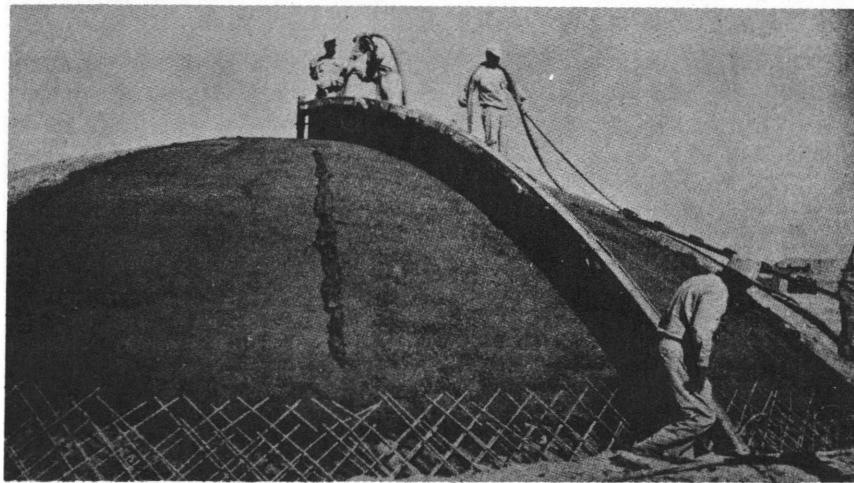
Shotcreting of earth-berm form for responding concrete dome.
